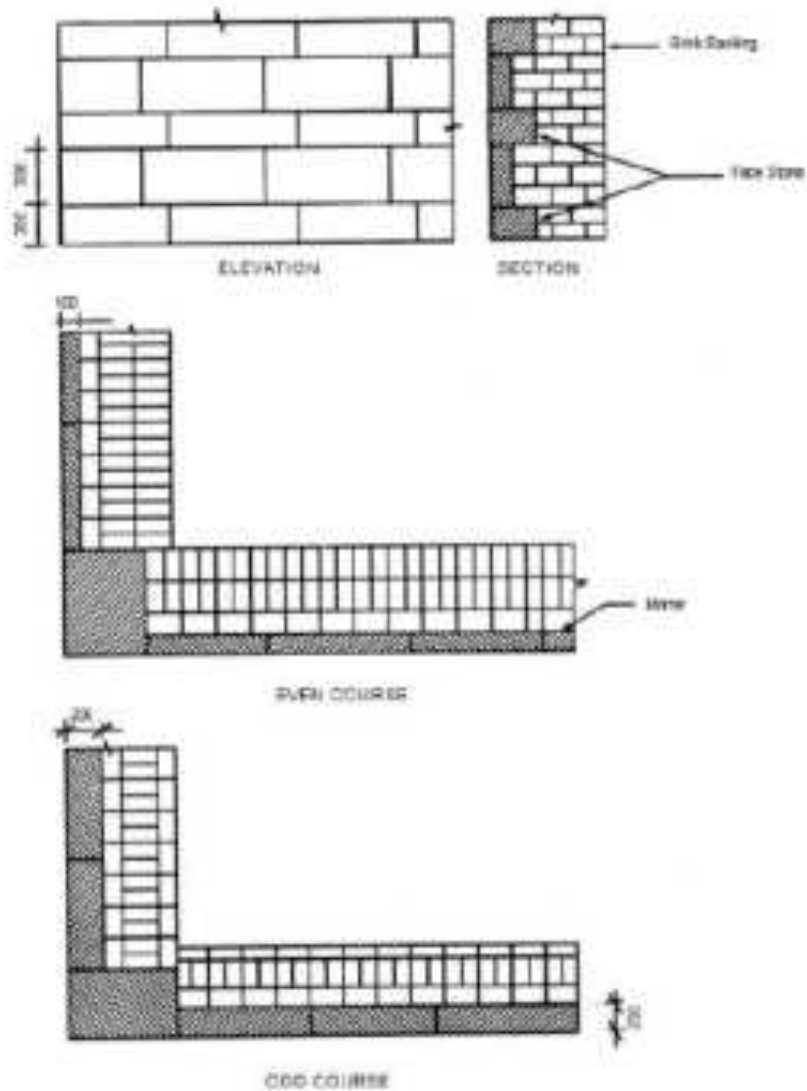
Ashlar Stone Masonry (with Brick Backing)
